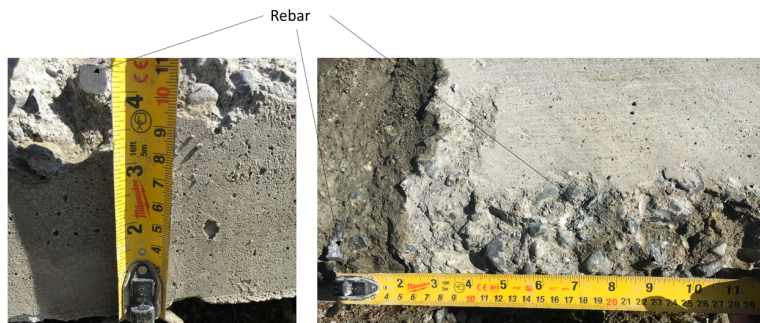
Destructive testing of the Slab at the University of Victoria to locate the rebar spacing and cover
